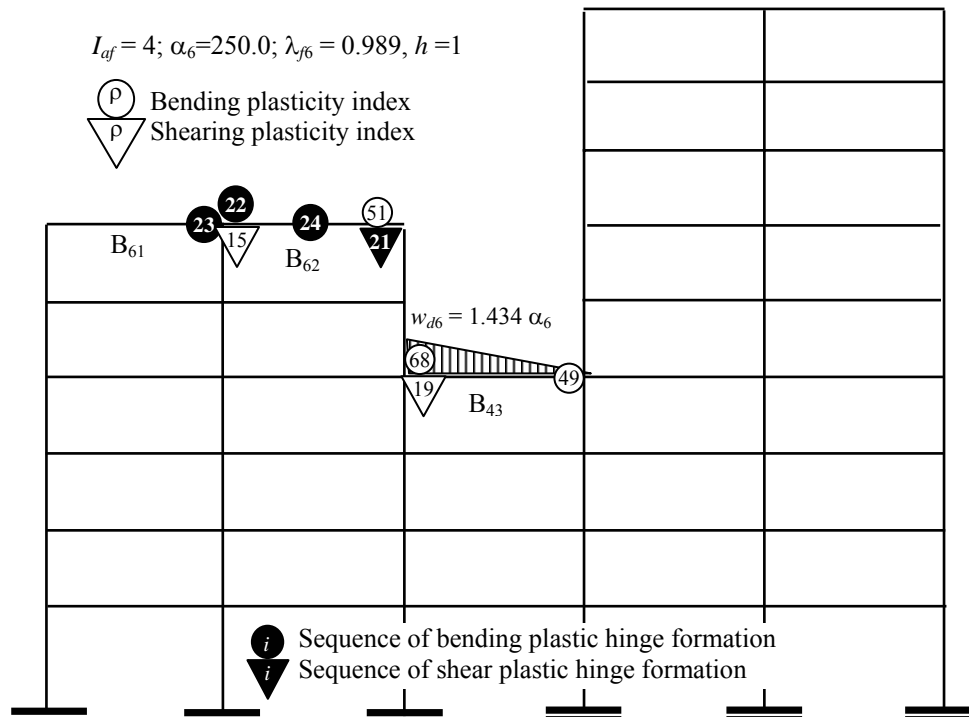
Example 2 (Los Angeles): Beam B₅₃ falls as debris loads and fails beam B₆₂ (Stage 6)
